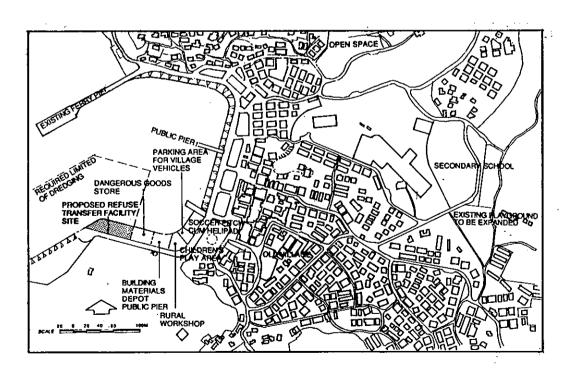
YUNG SHUE WAN TRANSFER FACILITY LOCATION PLAN
